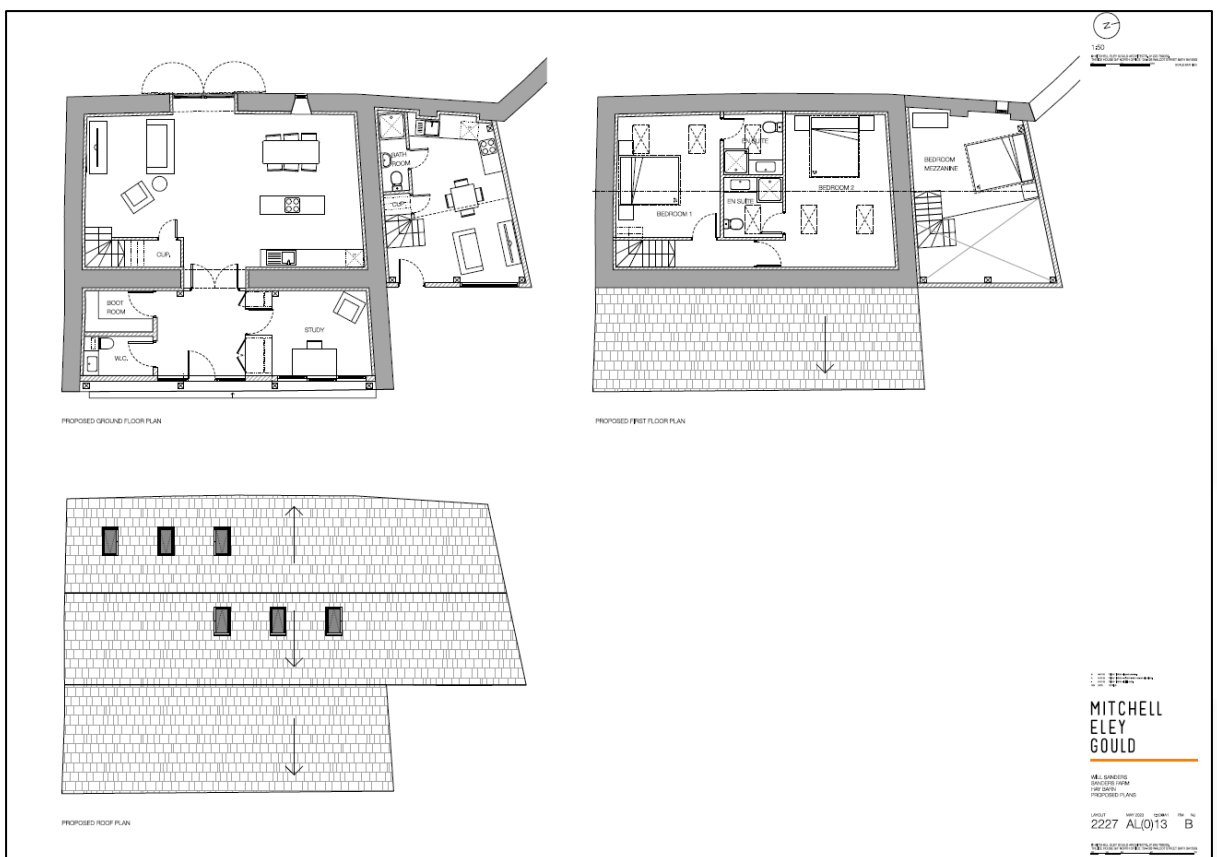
Proposed plan, Barn 1 (Hay Barn)
